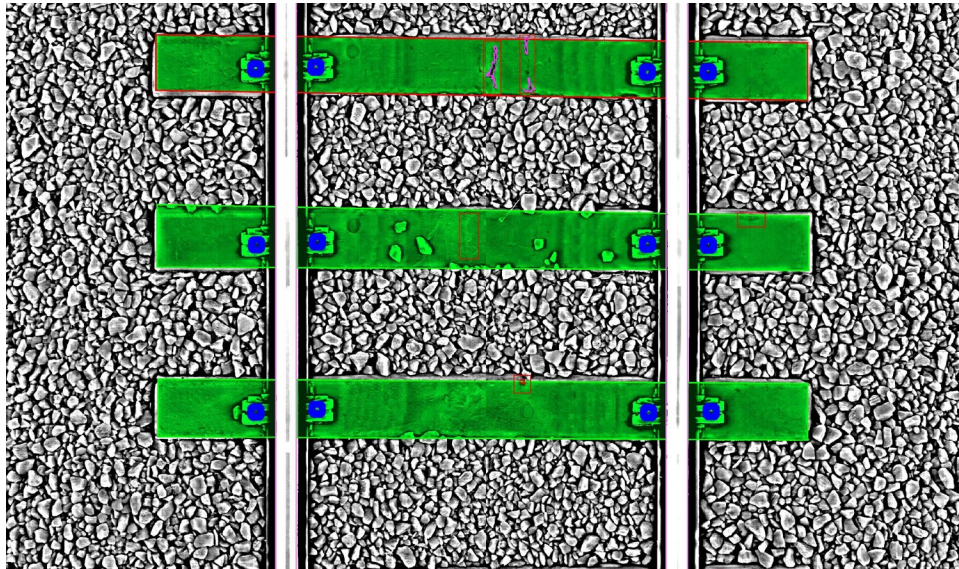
Intensity Image Showing Automatic Detection of Cracking and Spalling on Concrete Crossties
